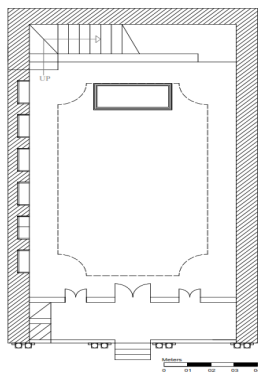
Ground Floor Plan – Gurudwara Guru Singh Sabha
